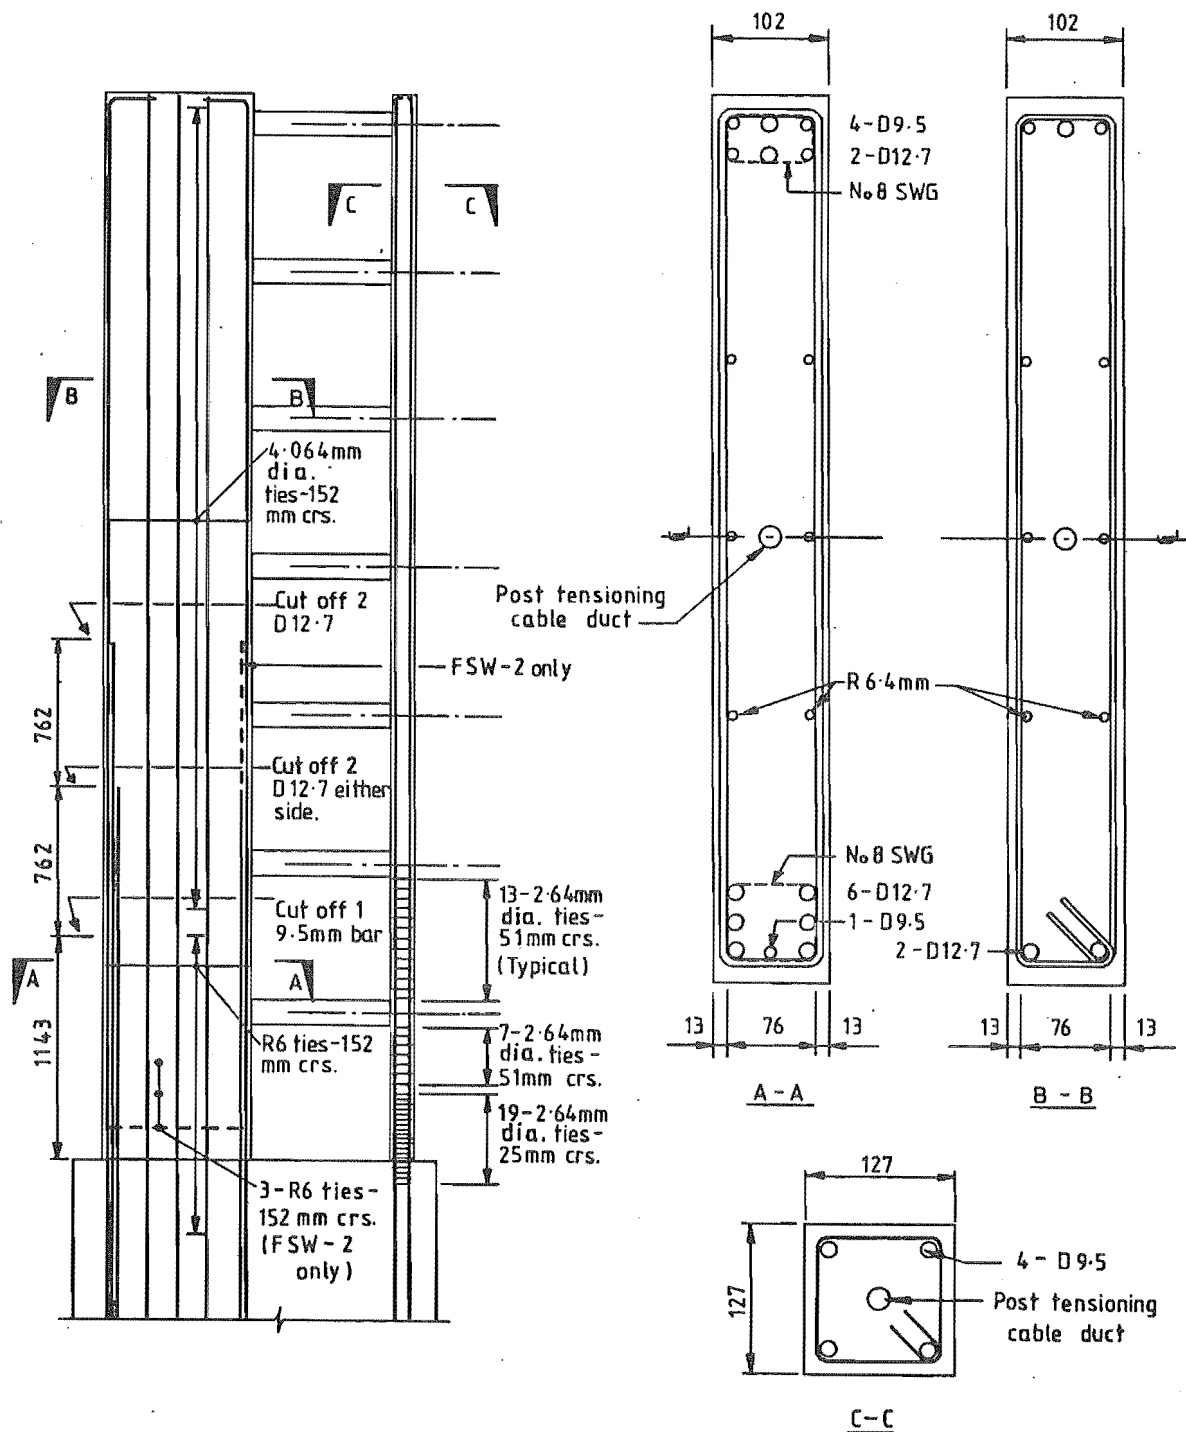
WALL AND COLUMN REINFORCEMENT, FSW-1 AND FSW-2
